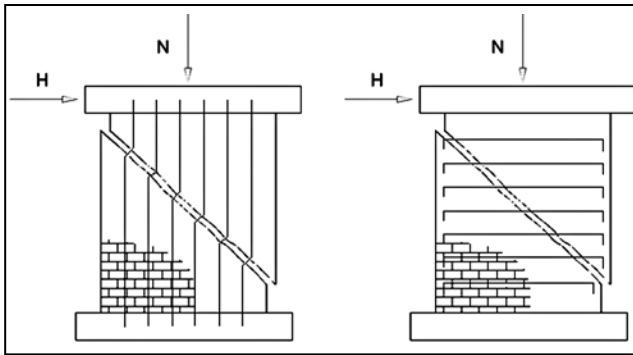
Mechanism of action of vertical and horizontal reinforcement in a masonry wall failing in shear
